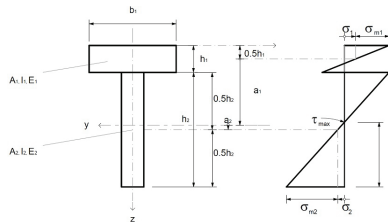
Cross-section and bending stress distribution of a timber concrete beam.
